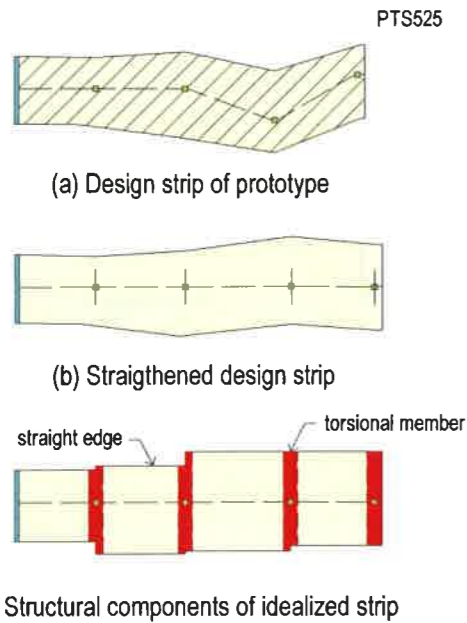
Isolated, and Idealized Design Strip showing the FEM Structural Components
